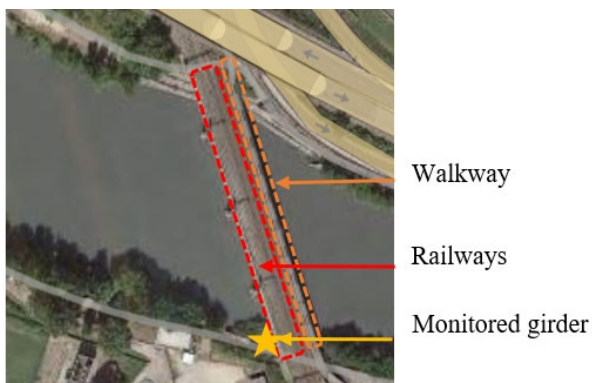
Monitoring area, railways and pedestrian walkway configuration.
